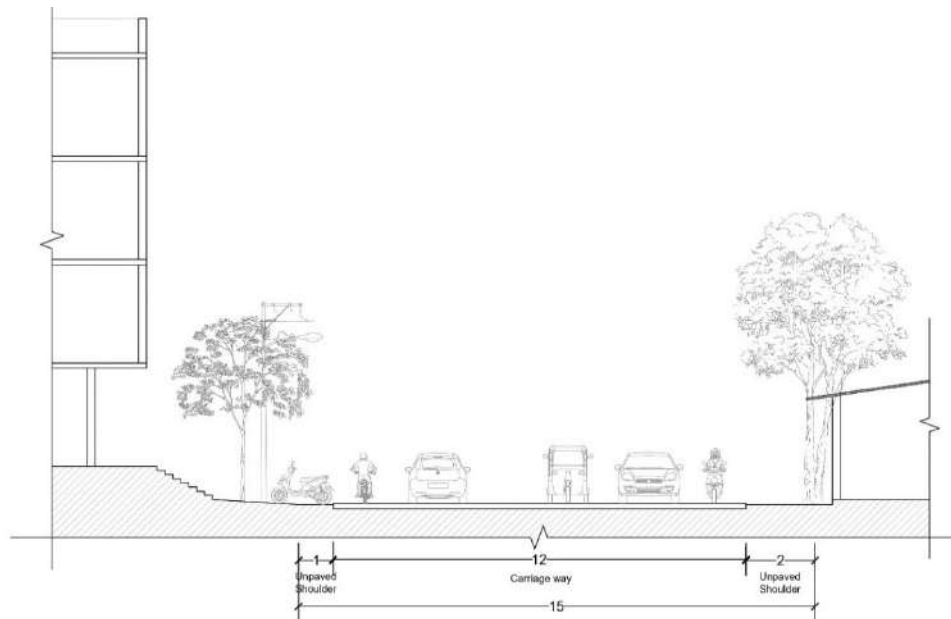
Road Cross Section: Bairamalguda Road near Krishna Prasad petrol bunk
